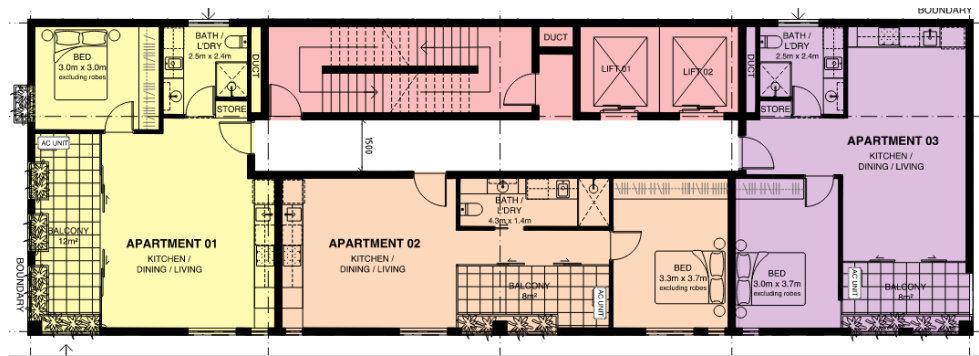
Proposed building typical apartment floor layout (1-bedroom levels)
